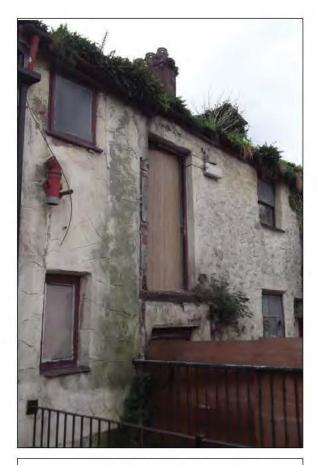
21 High Street Rear Elevation (Supplied By Client)
